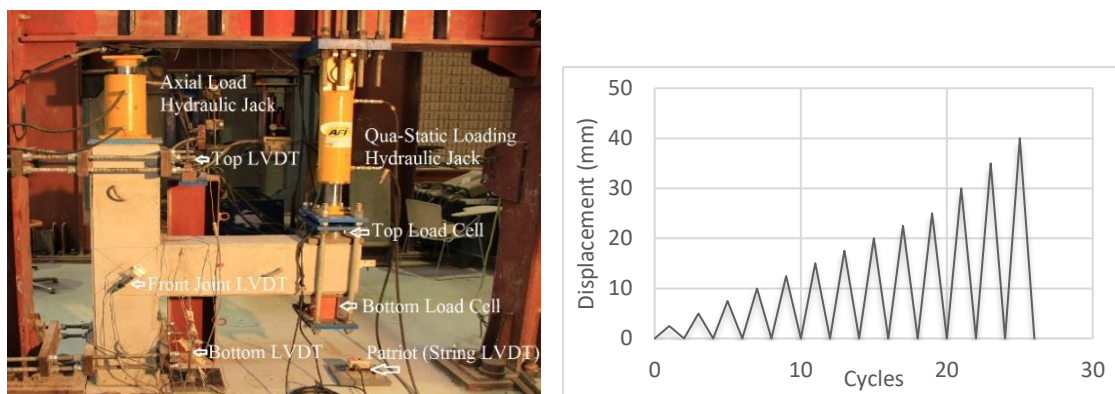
Testing arrangement and specimen (Left) and loading scheme (Right)
